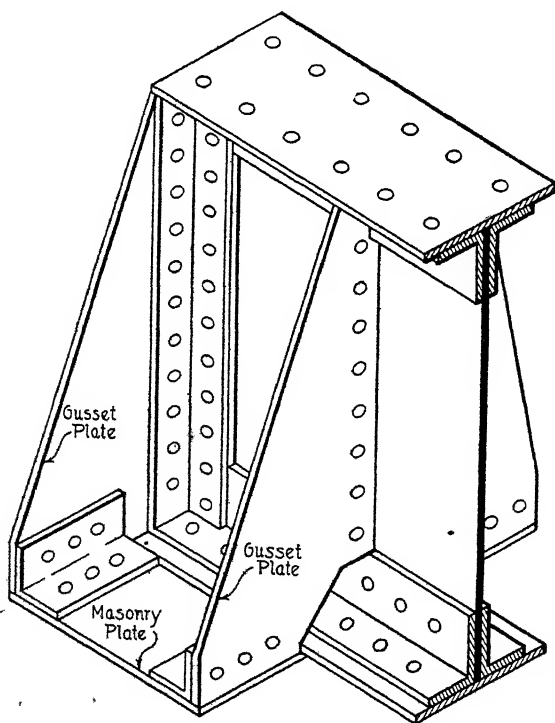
Arrangement where Masonry Plate is Used instead of Cast-Steel Pedestal.
